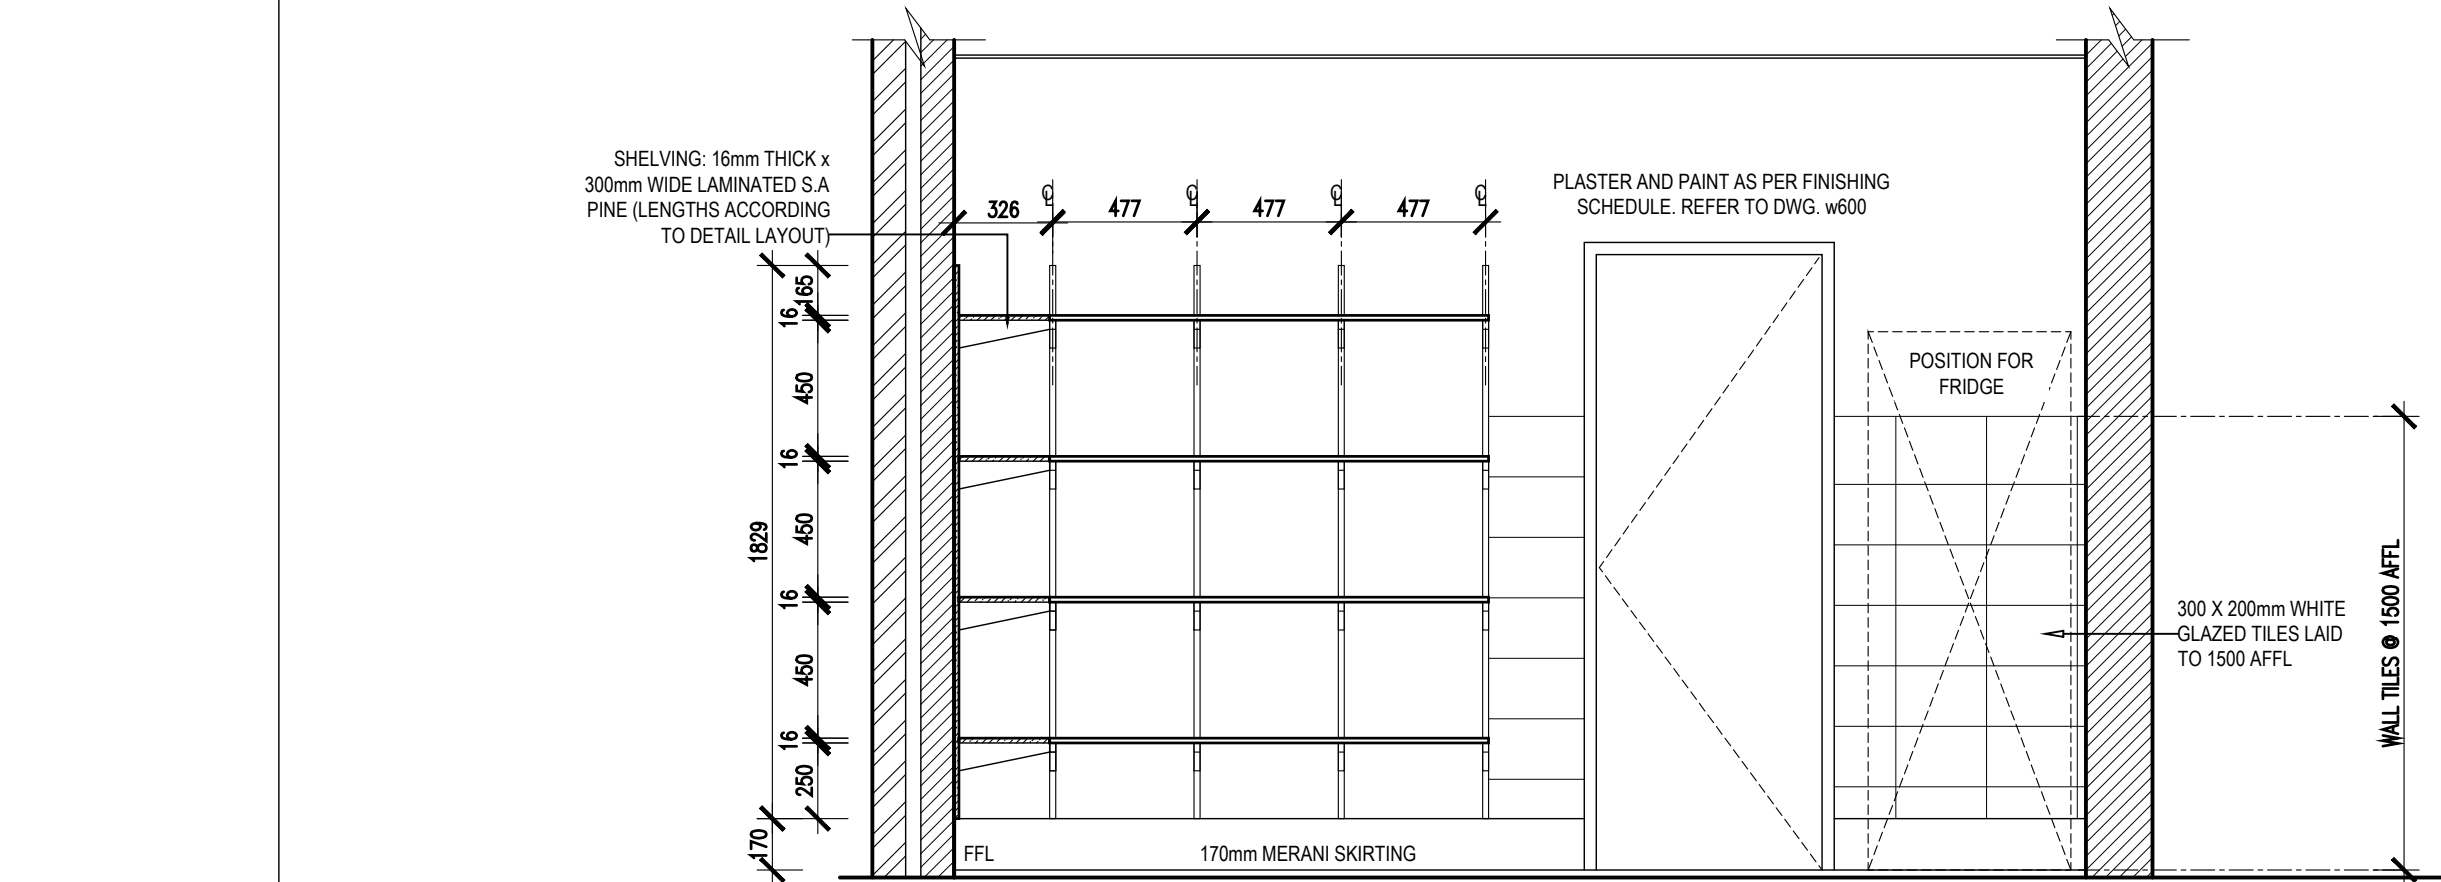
SECTIONAL ELEVATION A SCALE 1:25
